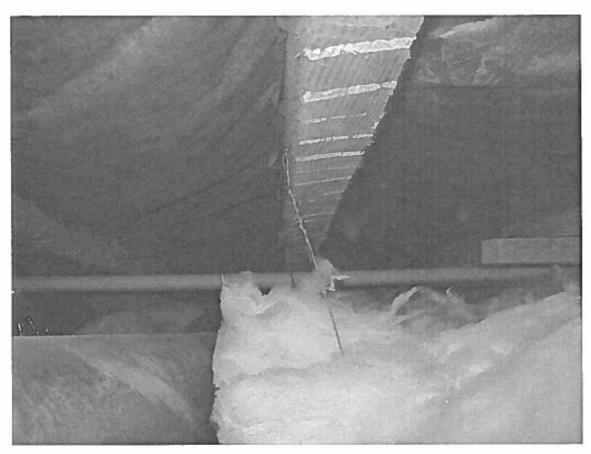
Roof joists and ceiling joists 2 x 8 @ 16"
